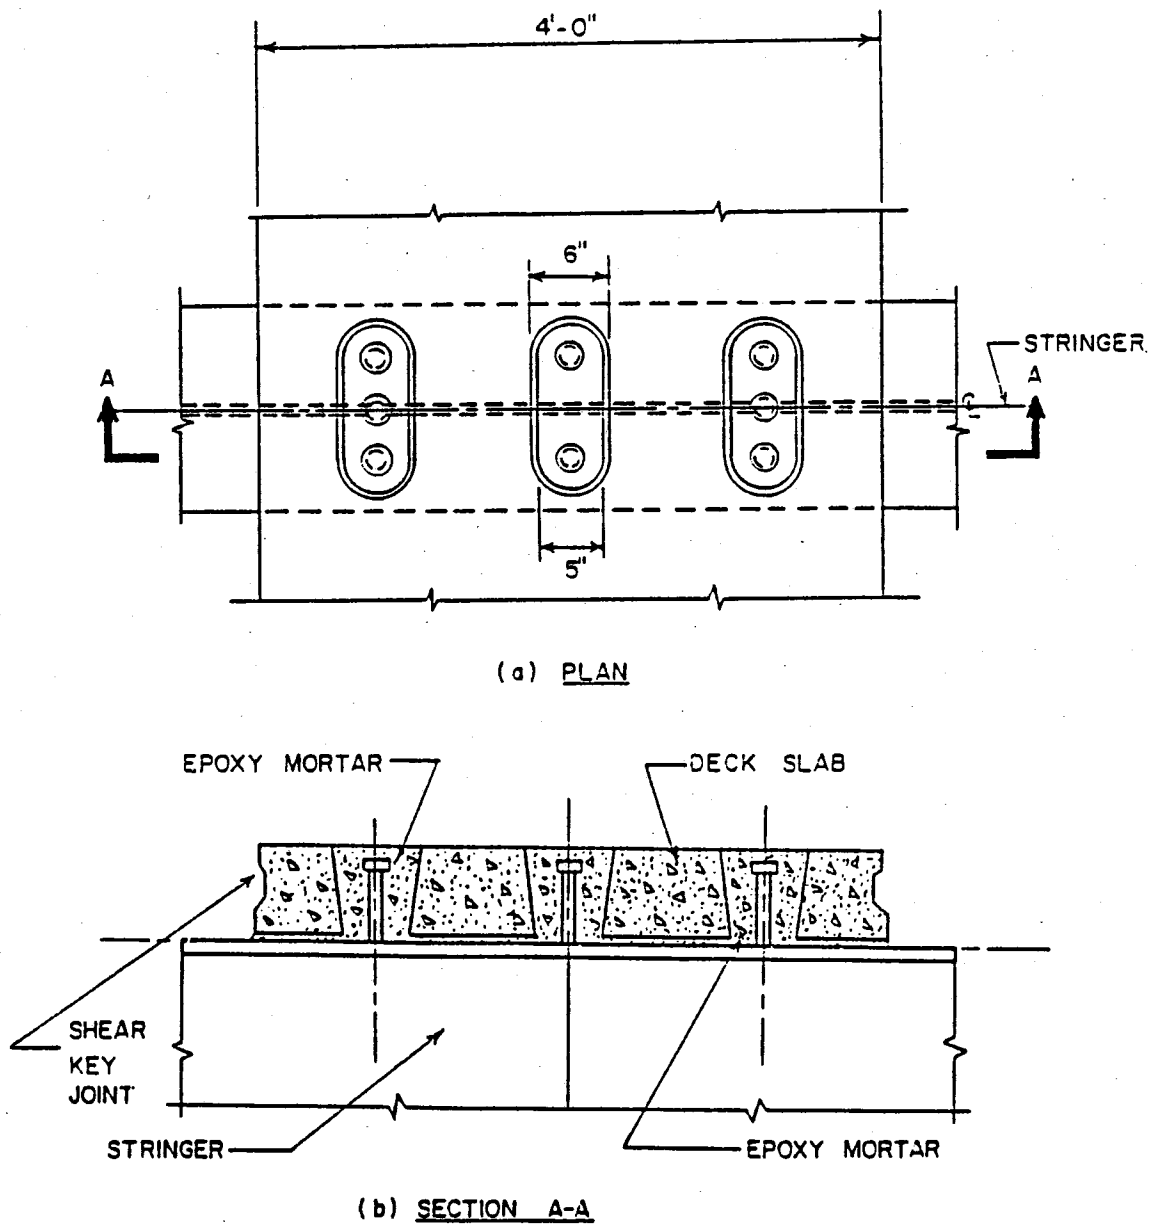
Welded Stud Connection Details, New York Thruway Overpass (12)
